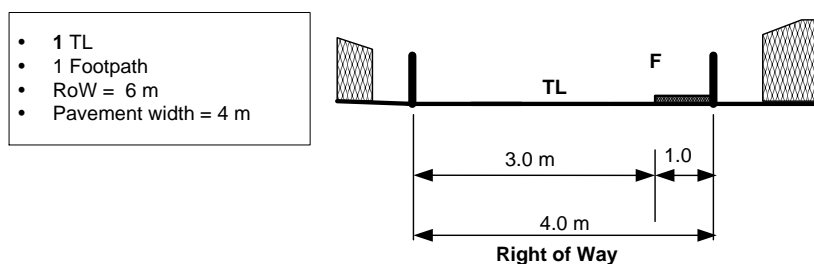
, Typical Cross section for N Roads (RoW 4 m)
